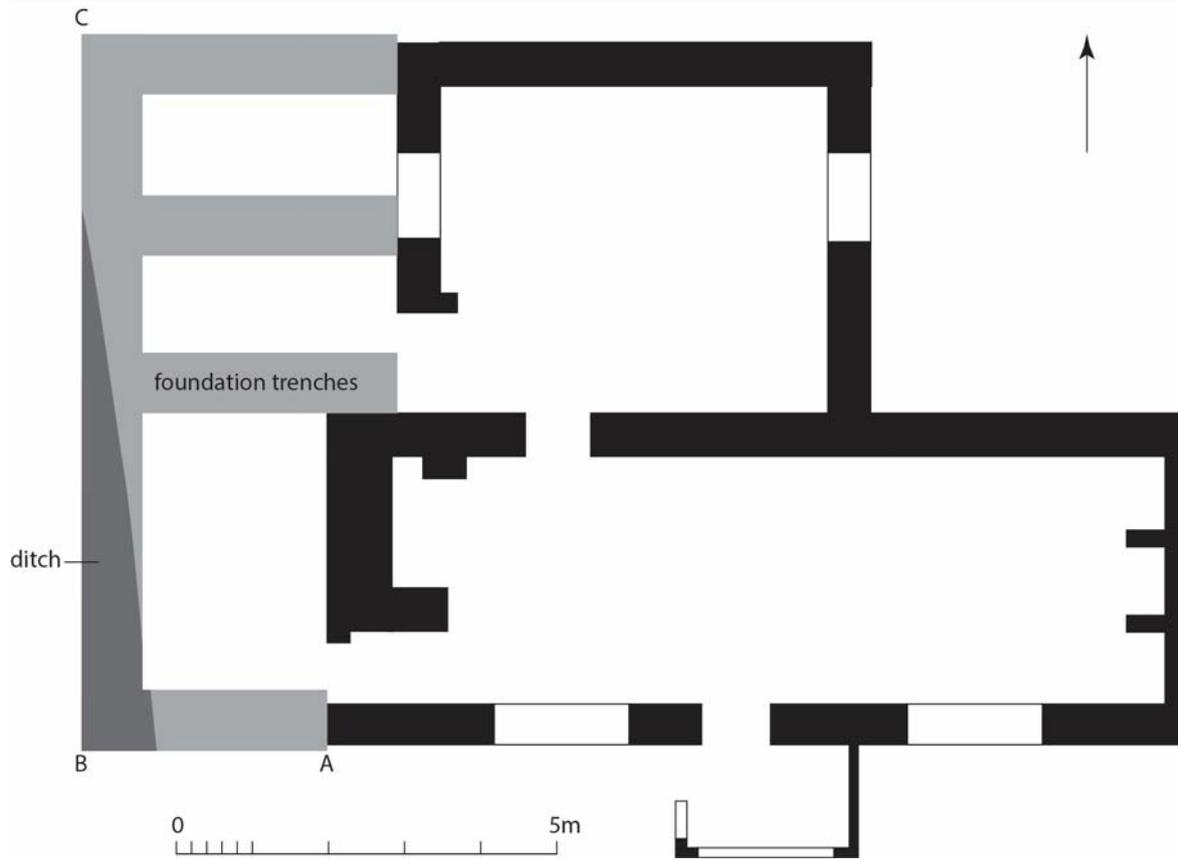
Plan of the foundation trenches and the location of the bailey ditch
